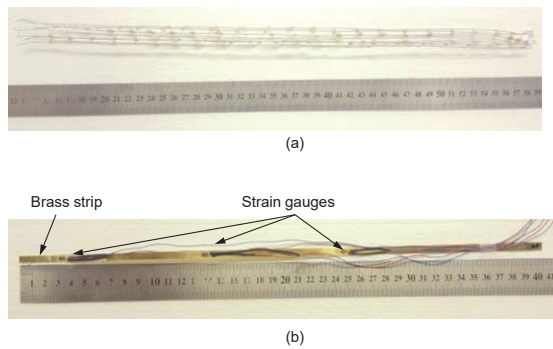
a) Reinforcing cage and b) instrumented brass strip.
